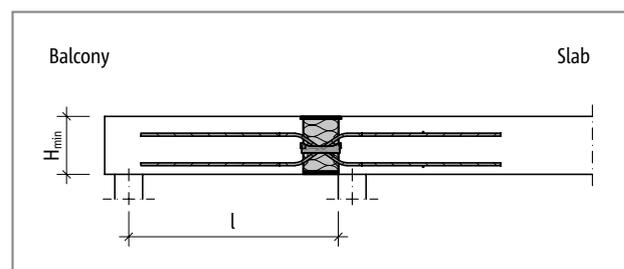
Schöck Isokorb® XT type Q-VV: Static system (XT type Q-VV5 to VV8)
